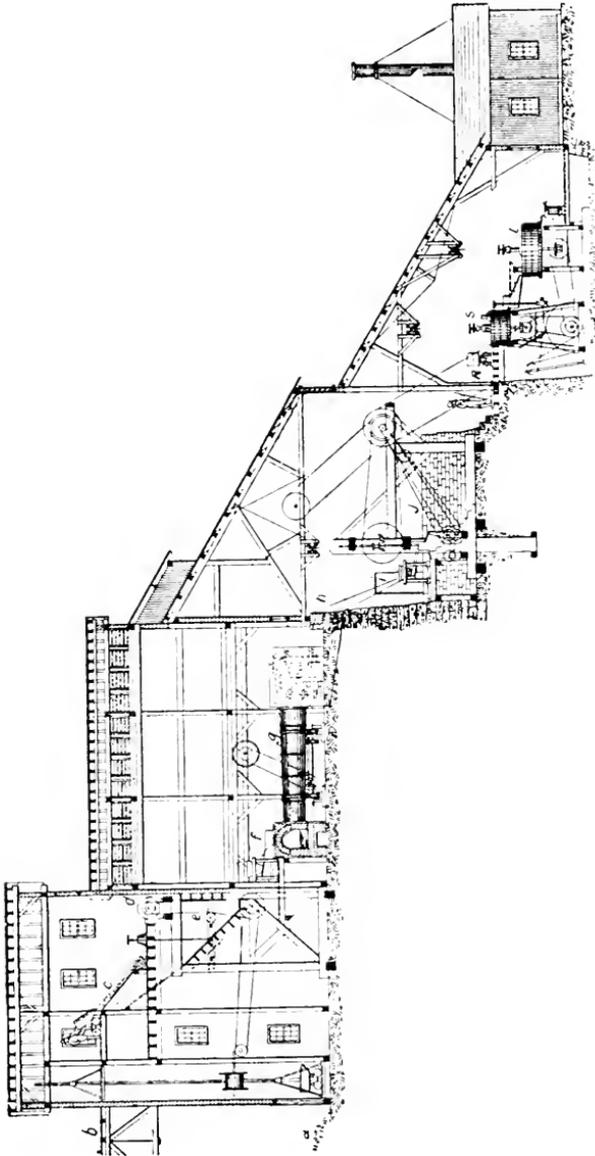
LONGITUDINAL SECTION OF 20-STAMP DRY CRUSHING SILVER MILL.
